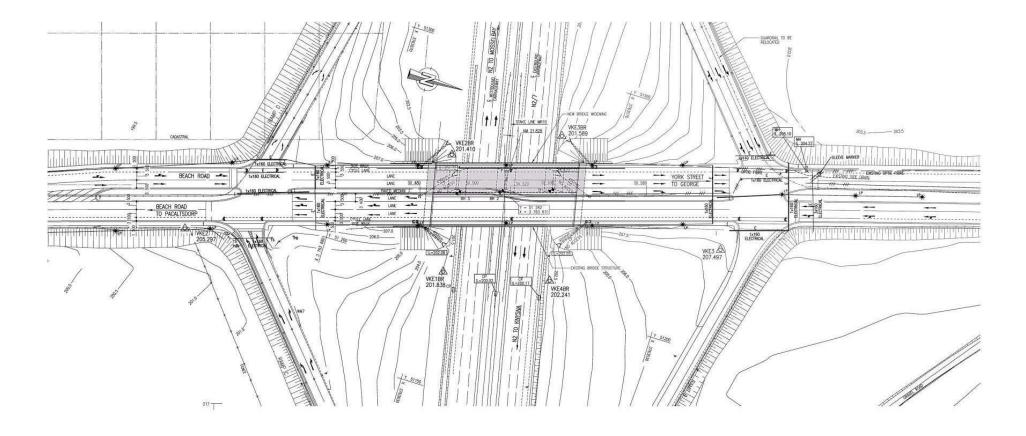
Pacaltsdorp N2 bridge widening – model proposed for Nelson Mandela Boulevard bridge over N2.
